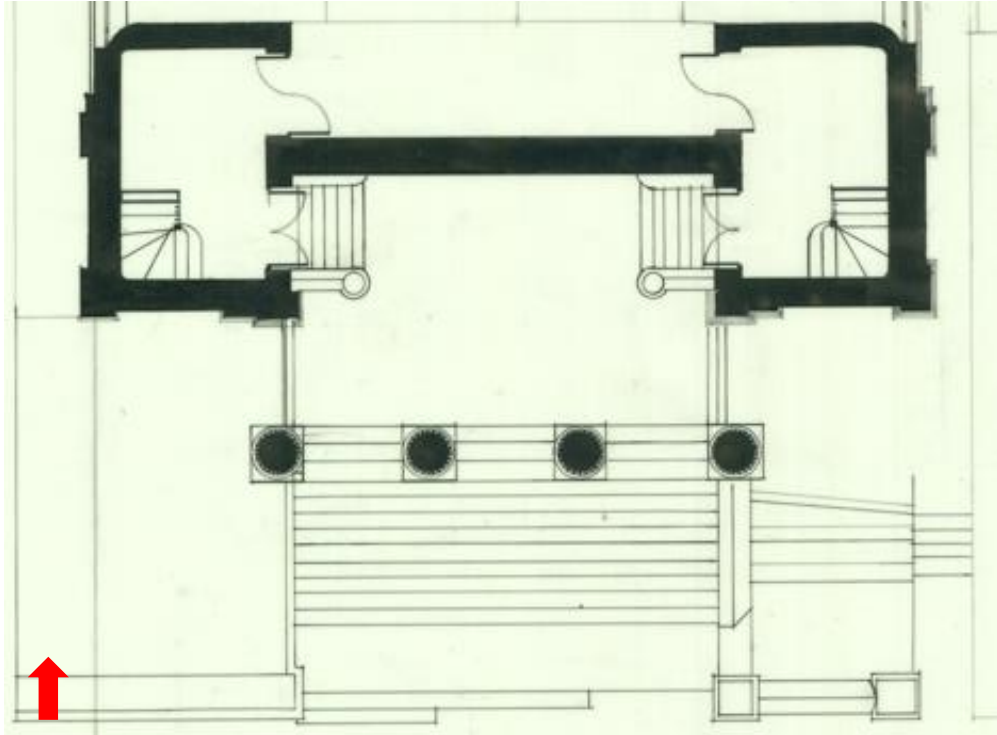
1981 drawing of the Baptist Church showing the frontage facing Collins Street (Source: SLV ID H2010.73/25)
